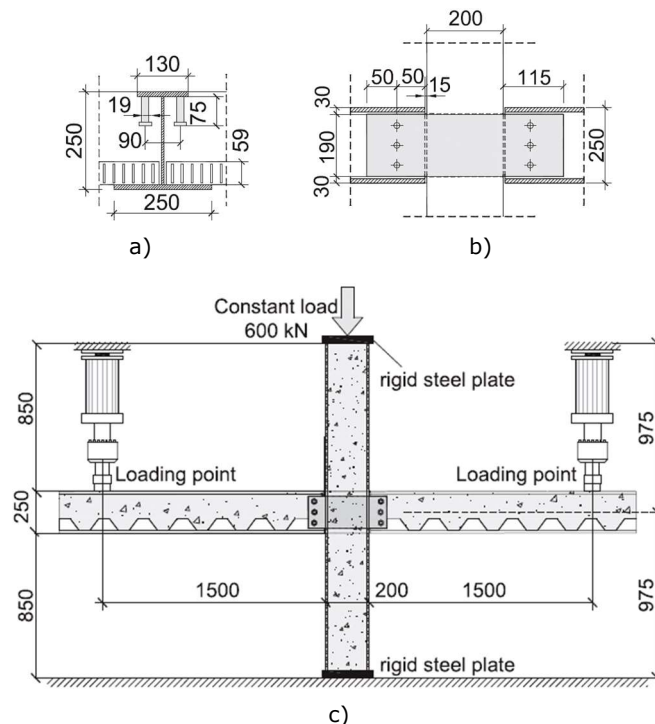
Images from De Nardin et al. [37]: a) cross section of slim-floor beam; b) bolted beam-to-column connection; c) test setup
